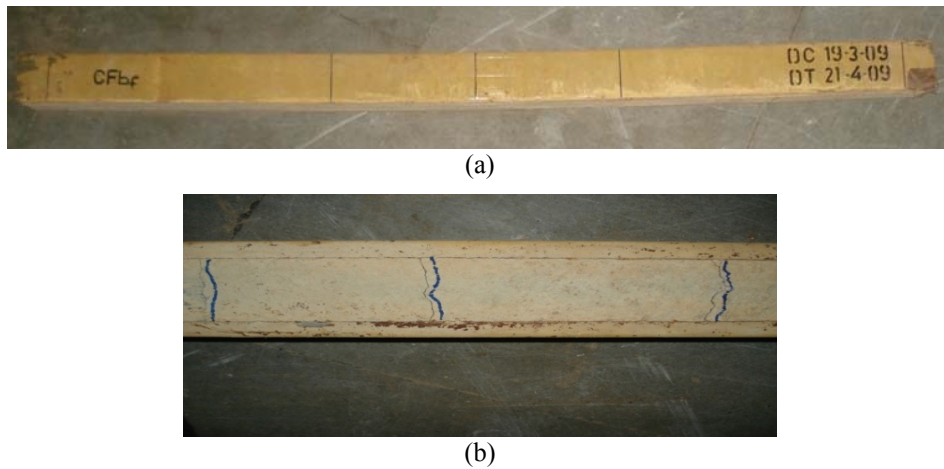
Failure Pattern of $CFbf$ (a) longitudinal view; (b) bottom view
